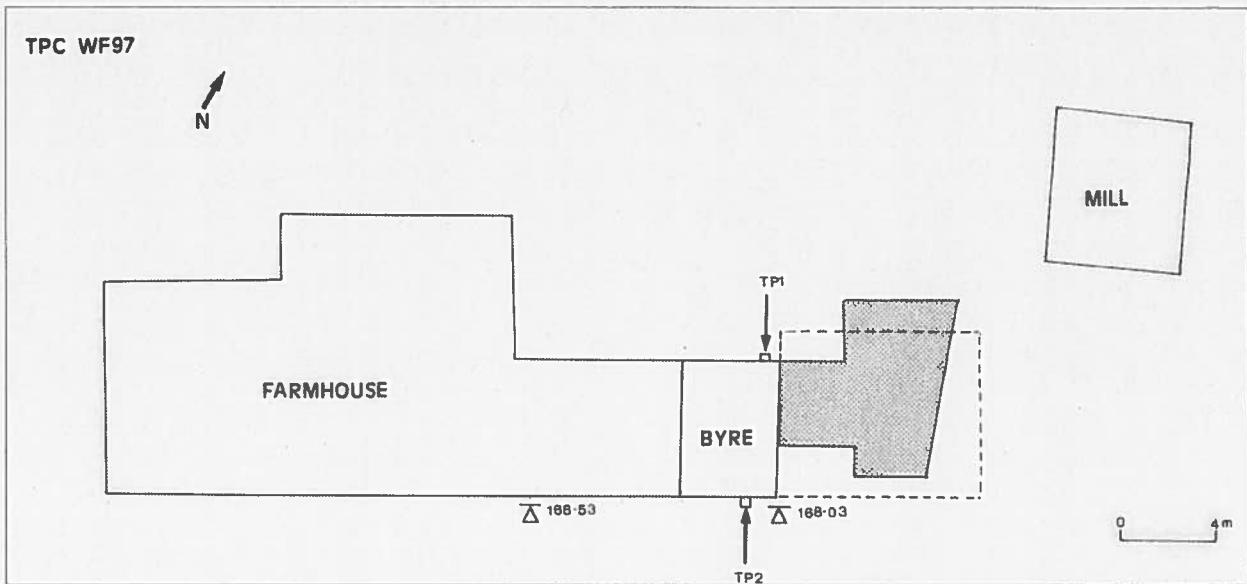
Footprint plan of Woolcombe farmhouse (1997). The site of the bottling plant is shaded, the dashed line shows the approximate area of new building foundations (see Figure 12) (Hewitt 1997b, 19).
